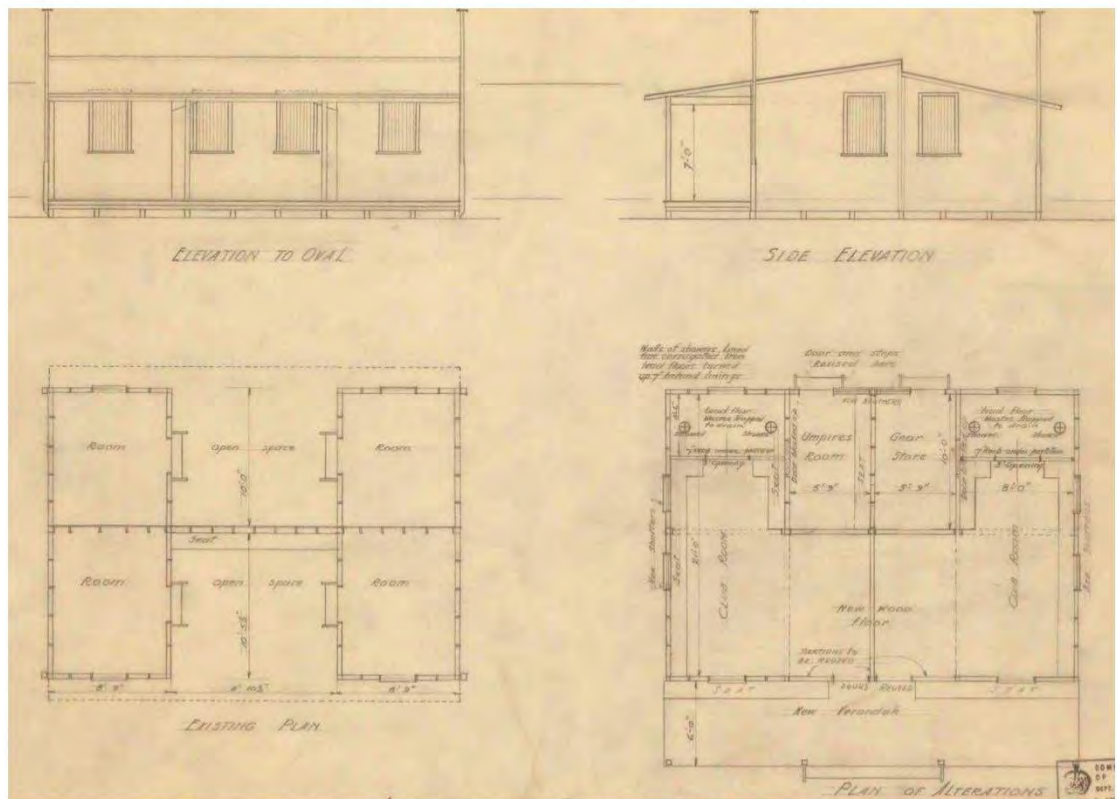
Plans and elevations for alterations to the Pavilion at Kingston Oval (1938)
